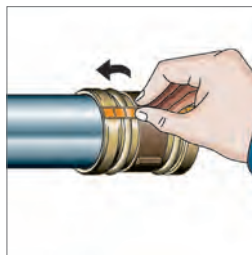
Remove the checking strip – the connection is marked as having been pressed.
